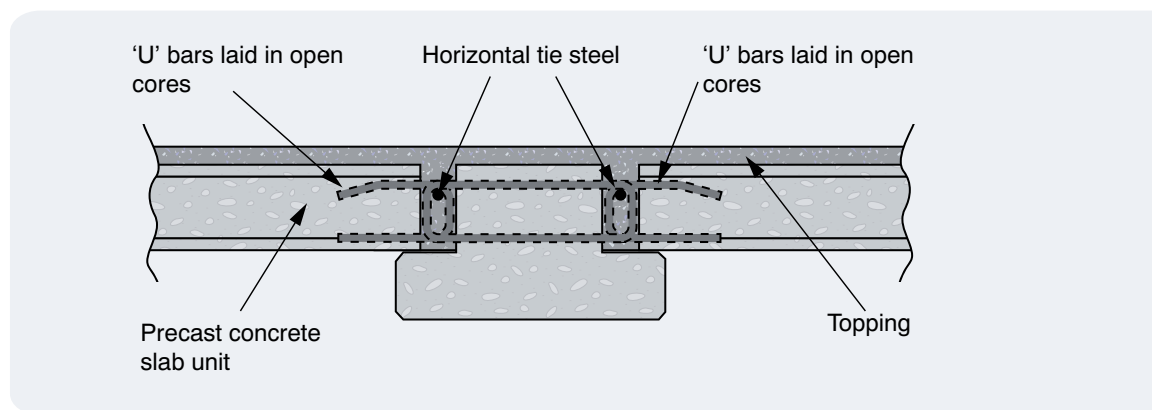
Precast concrete beam-precast slab connection detail incorporating ties. Central beam detail.
